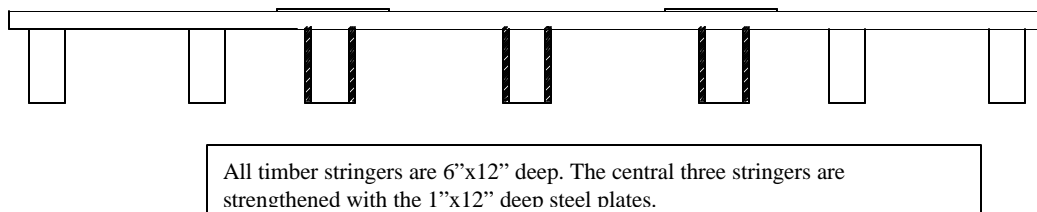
New timber deck layout with the steel-timber composite stringers
